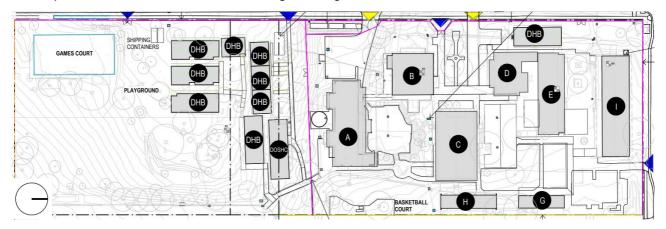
Site Plan with Exsting Conditions and buildings, noting that the site plan does not show the eastern most portion of the site, which is currently vacant (Source: Pedavoli Architects)
